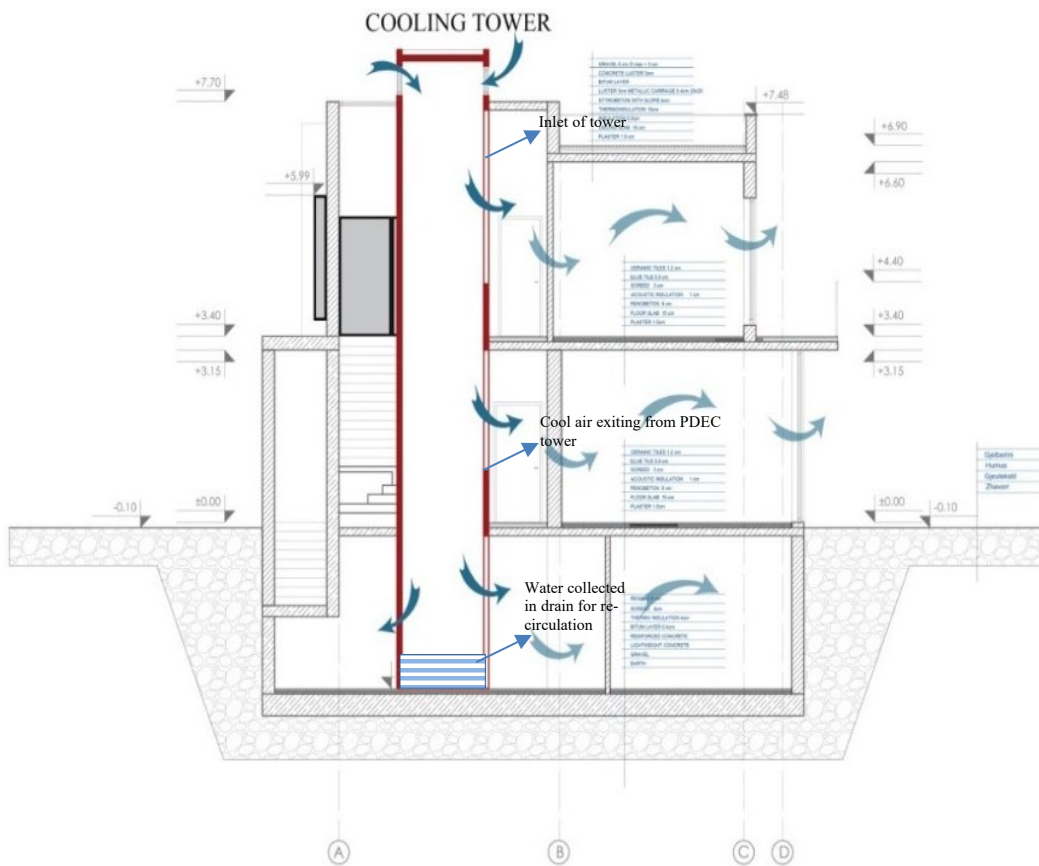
Cooling tower Section, A-A (Cani, 2023)
